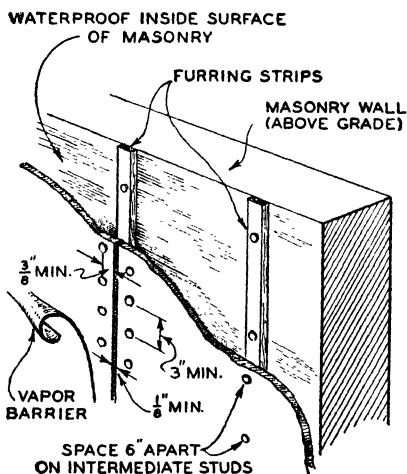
Interior View of Masonry Wall Showing Application of Furring Strips and Insulating Board
